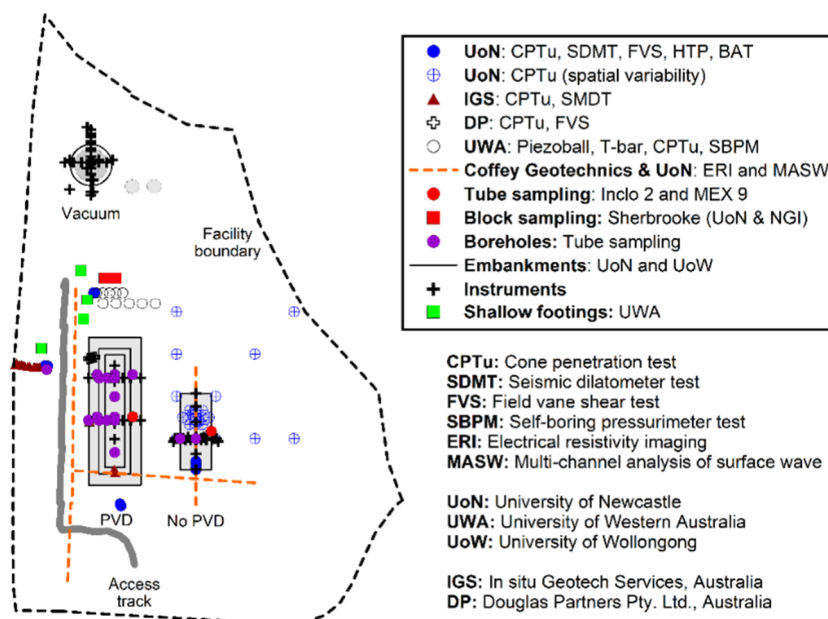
Plan view of the Ballina National Field-Testing Facility including location of in-situ tests conducted at the site (Kelly, et al., 2017).
